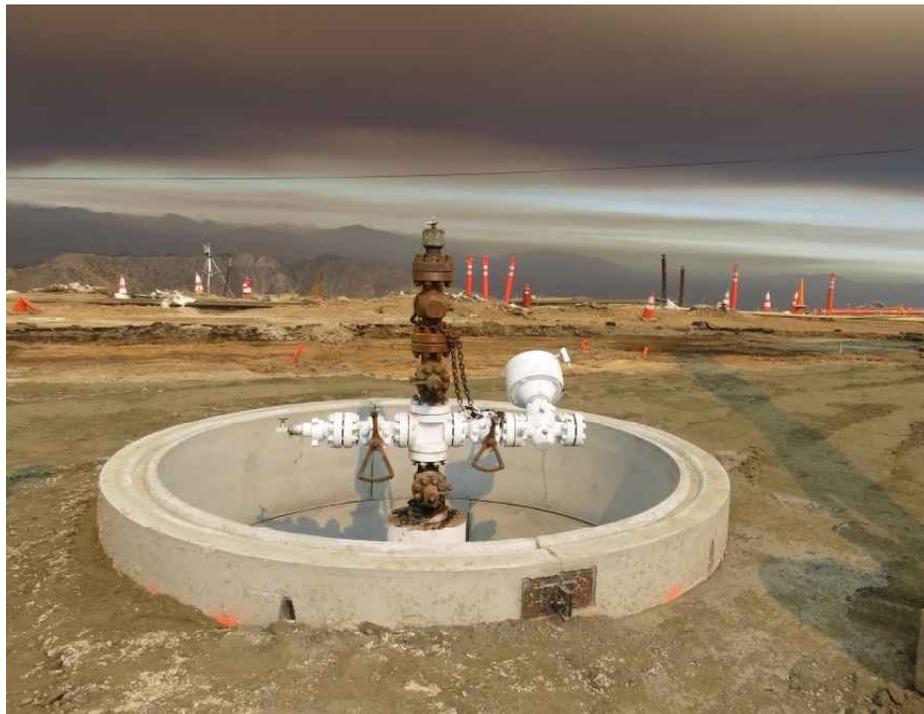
SS-25's Crater Slurry Backfilled to Site Grade Elevation
